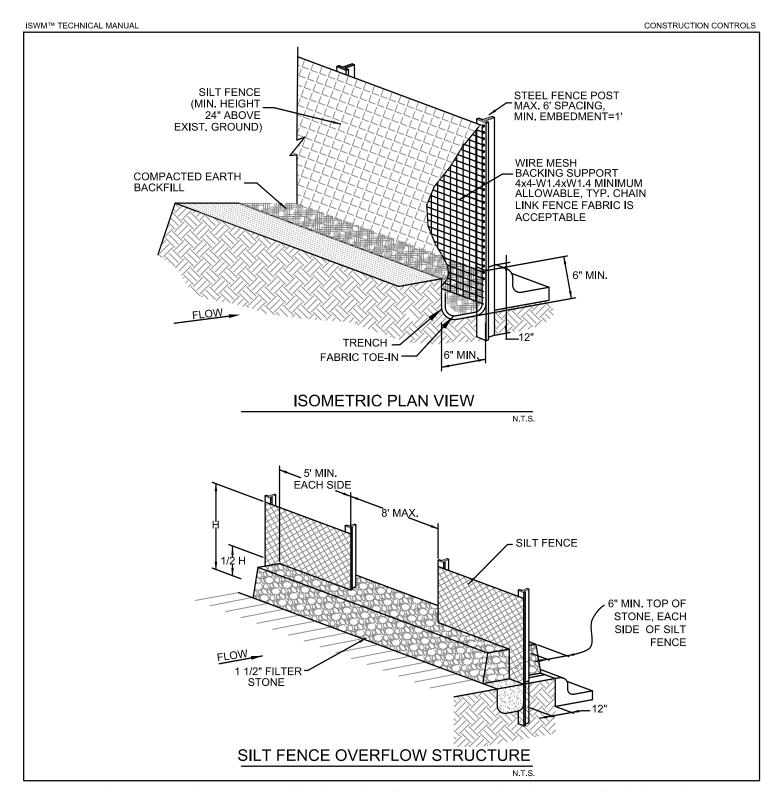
STANDARD CONSTRUCTION DETAIL - FOR SILT FENCE (1 OF 2)
